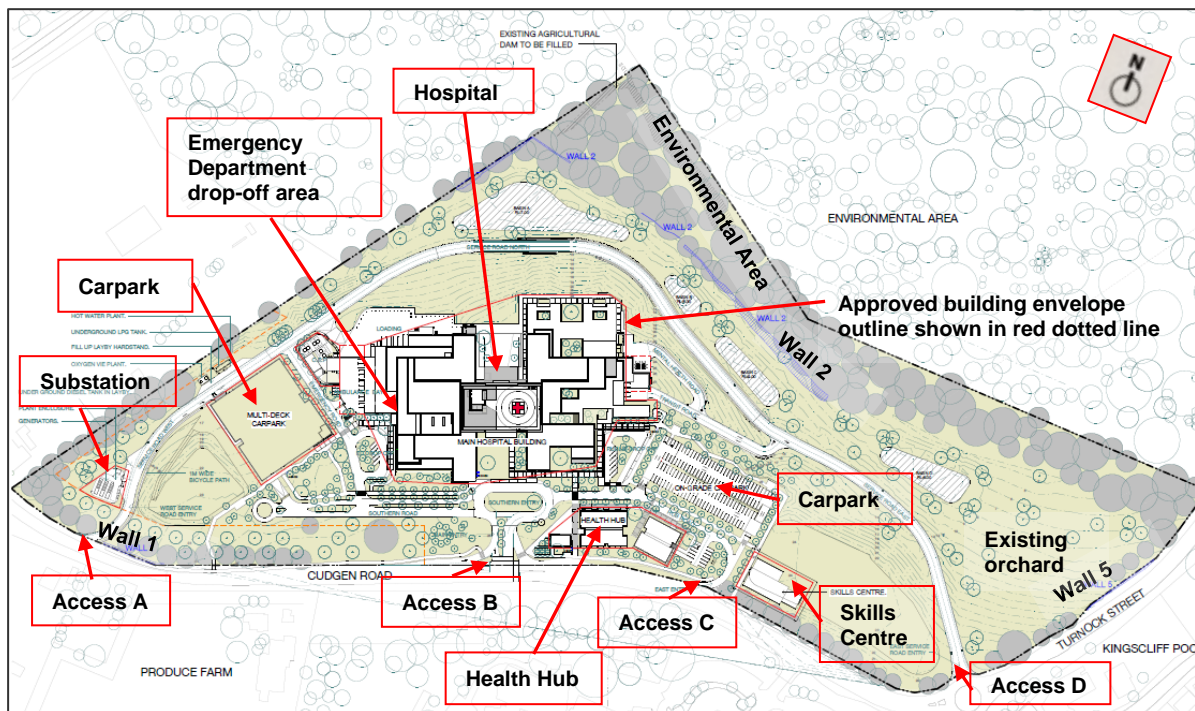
| Site layout and location of site access points (Source: Applicant's RTS)
